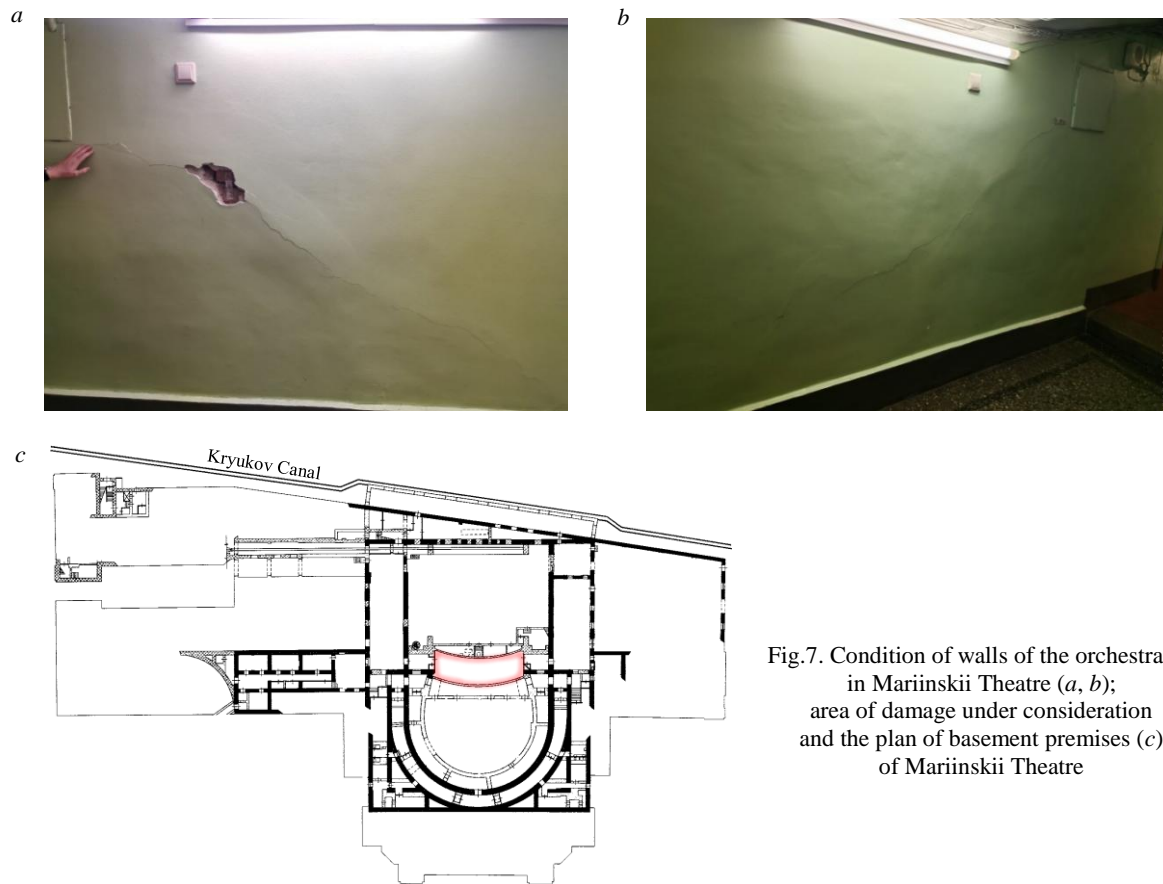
Condition of walls of the orchestra pit in Mariinskii Theatre (a, b); area of damage under consideration and the plan of basement premises (c) of Mariinskii Theatre
